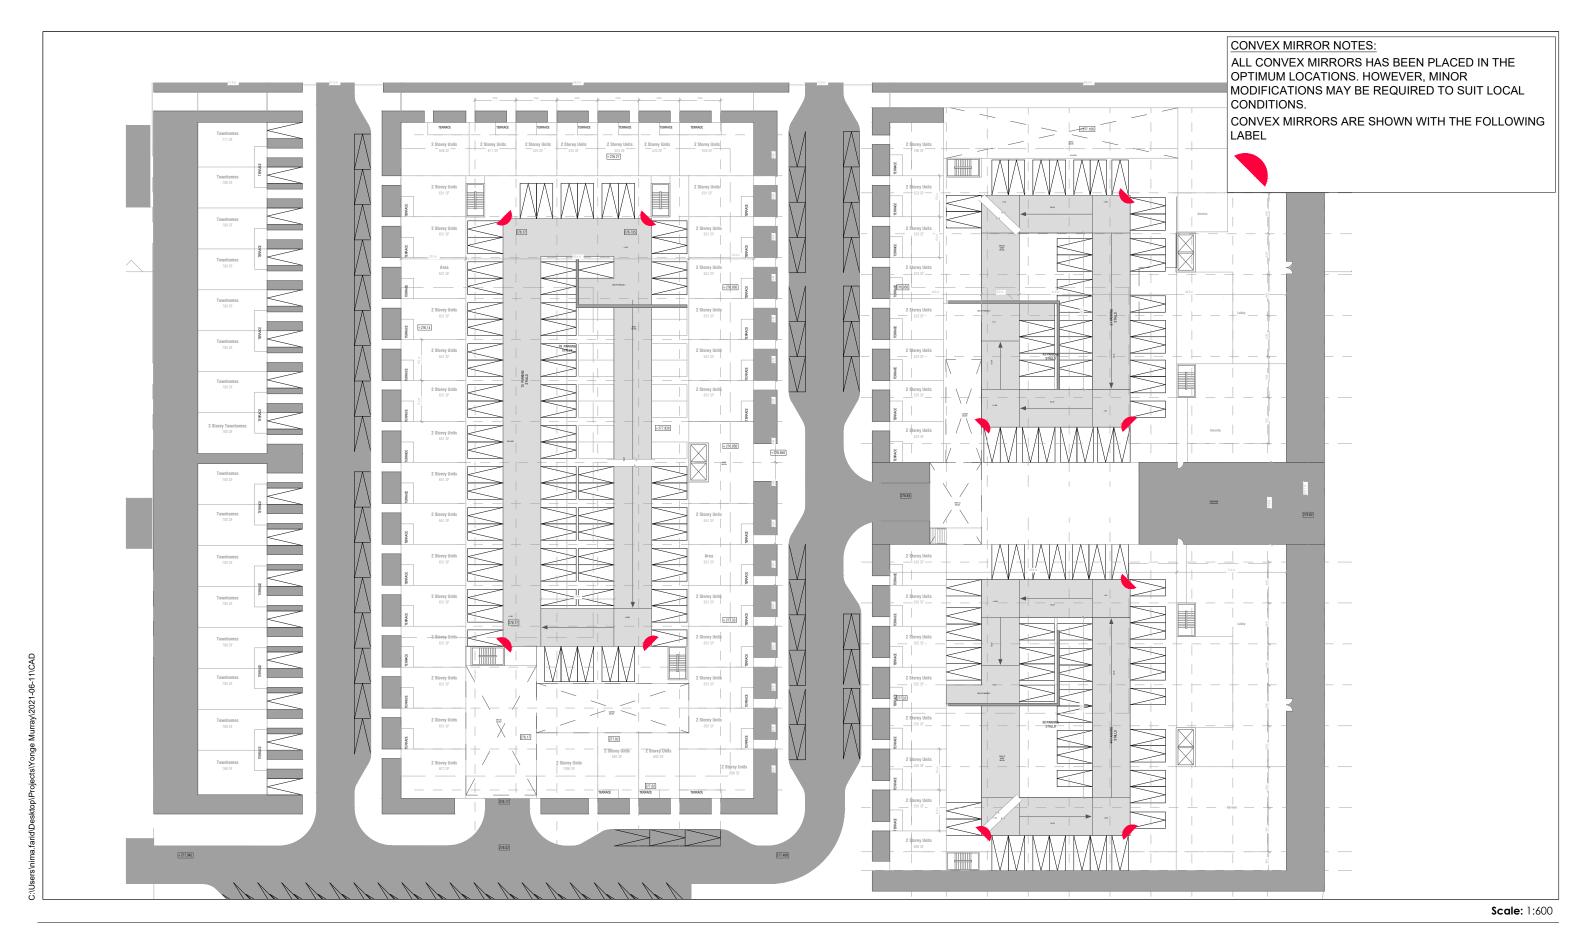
Convex Mirror Plan - 2nd Floor Yonge and Murray
